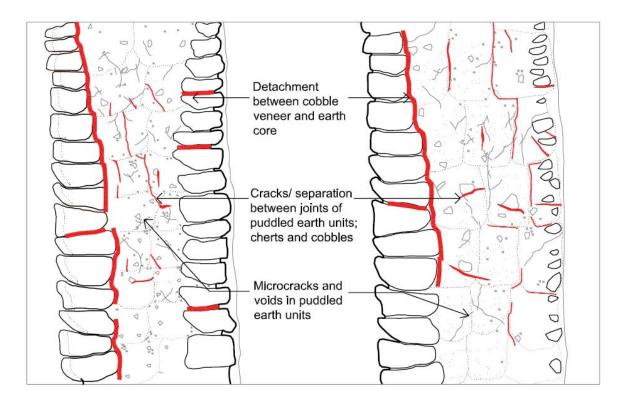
Wall Constructions depicting the defects (Chaudhry' 07)
